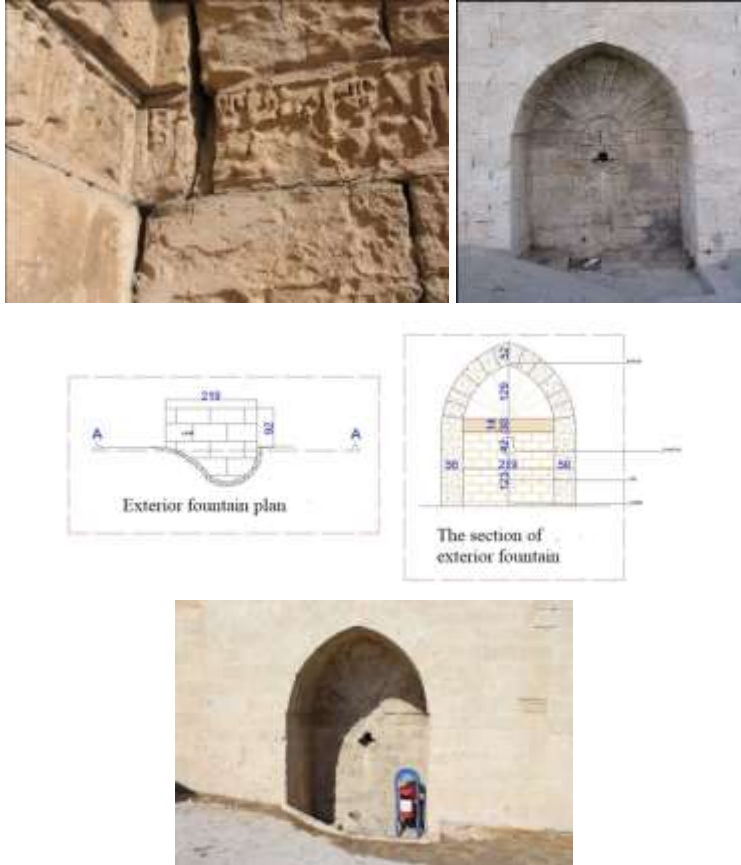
Fountain Plan-Section and Writing Arch at the Exterior Façade of Zinciriye Madrasah (Çağlayan, 2019)
